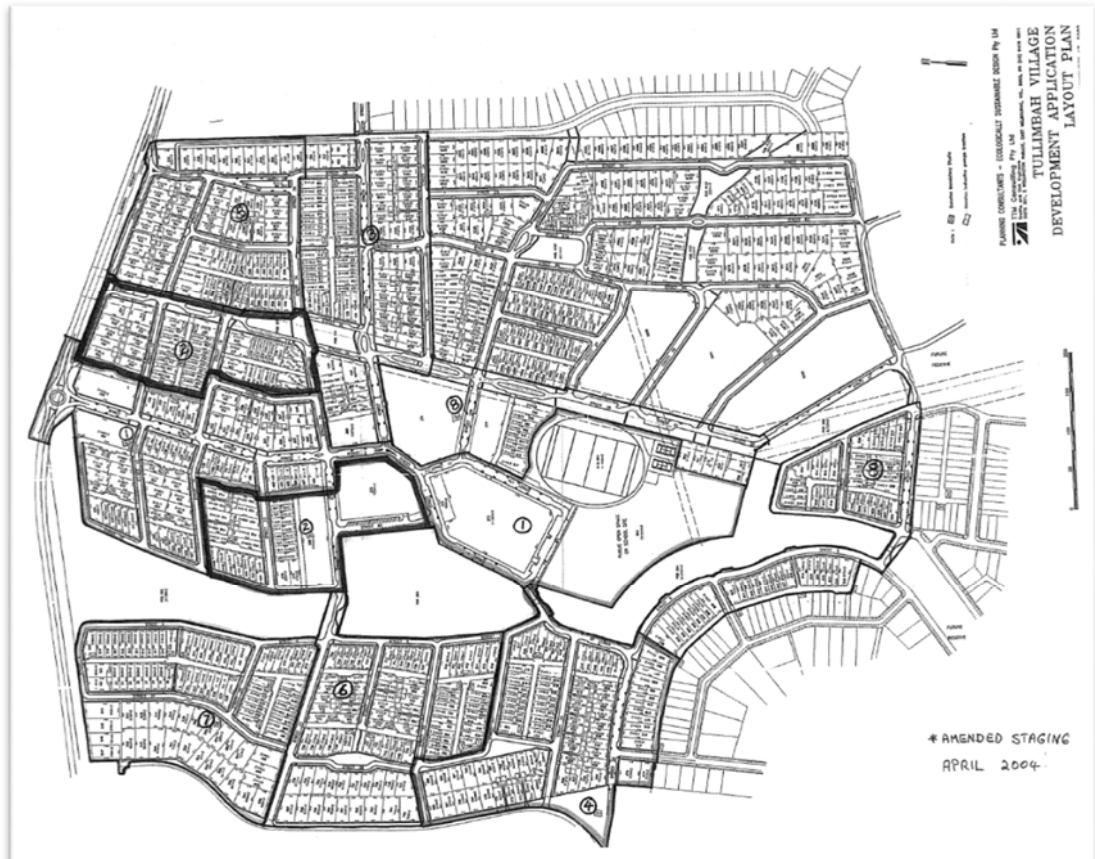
Approved Development Consent No. 741/2002 Subdivision Plan
